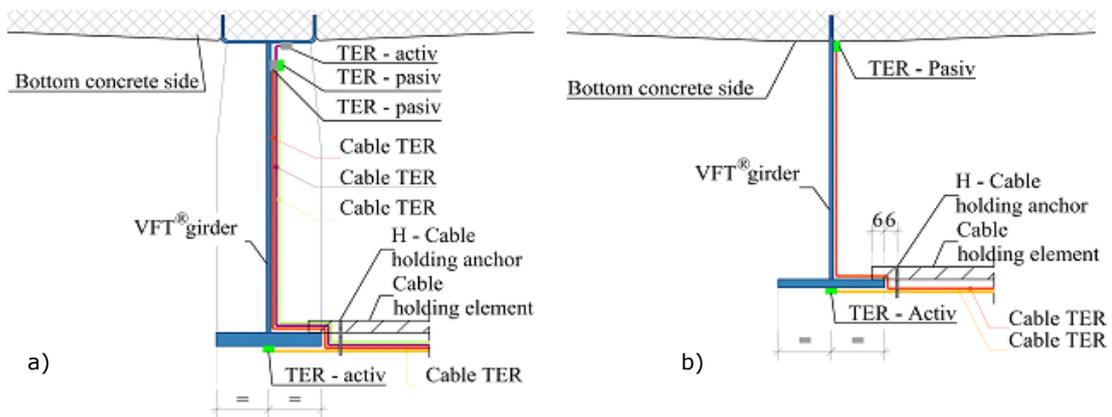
Installed strains on the section of the bridge; a) Cross section of the supports area; b) Cross section of the field.
